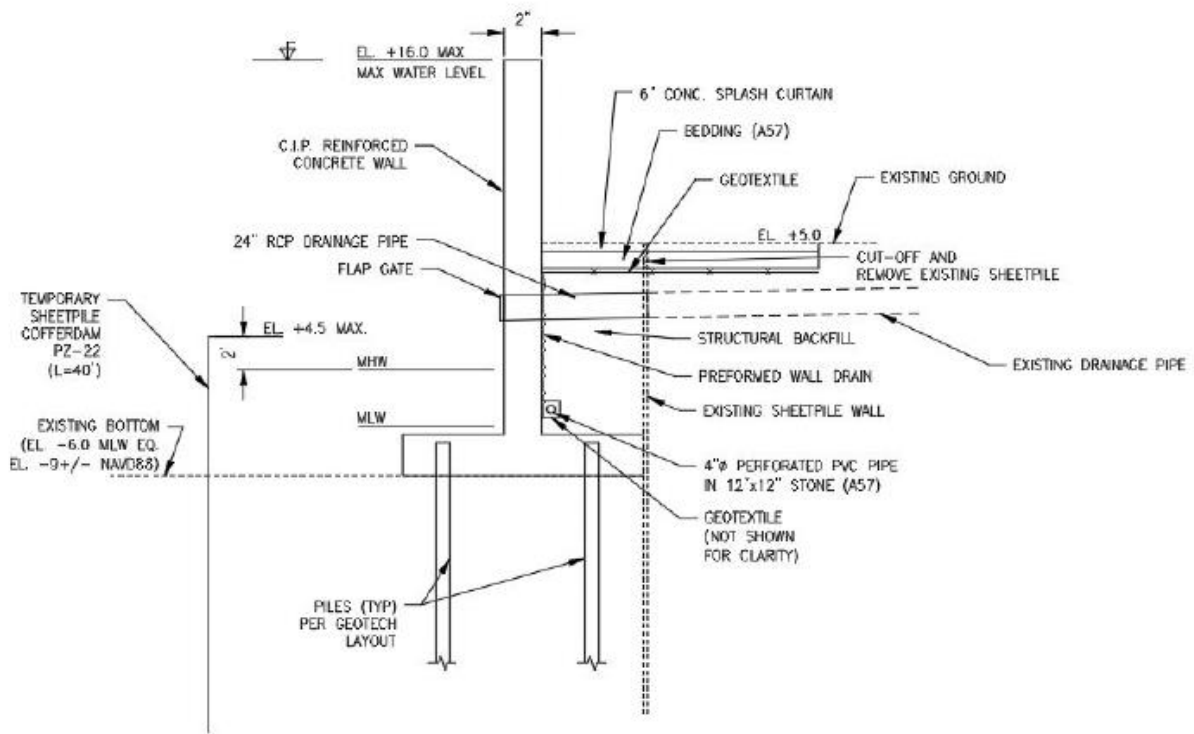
Typical Section – Concrete Cantilever Wall on Piles – Type B
